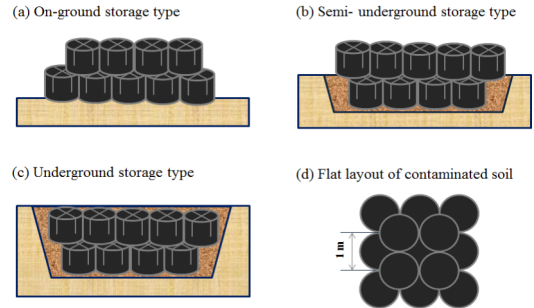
Types of temporary storage facility: (a) On-ground storage type, (b) Semi-ground storage type, (c) Underground storage type, (d) Flat layout of decontamination waste.
